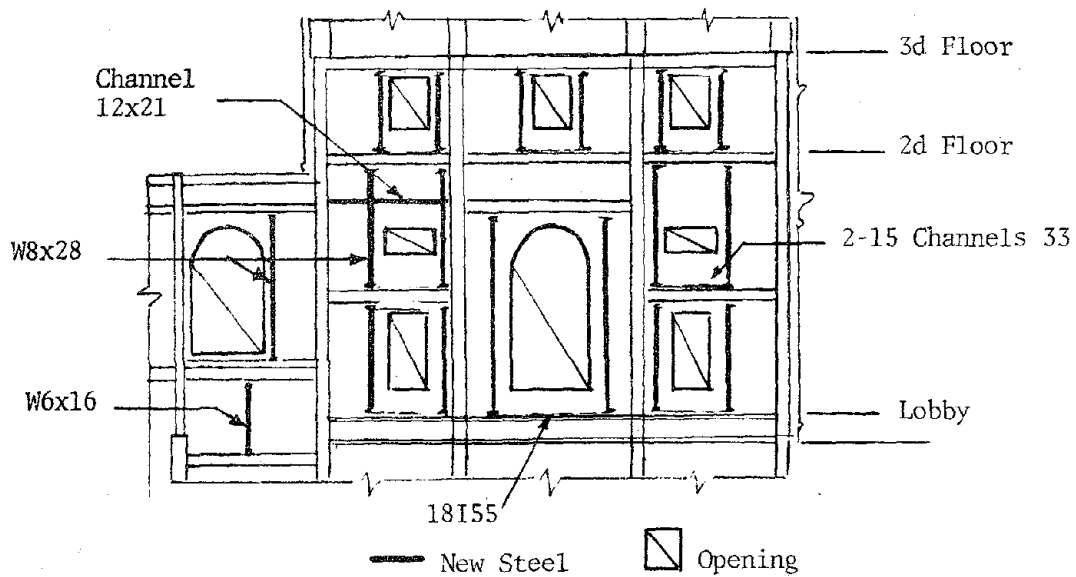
(b) STEEL FRAMING REINFORCEMENT SOUTH FACE
